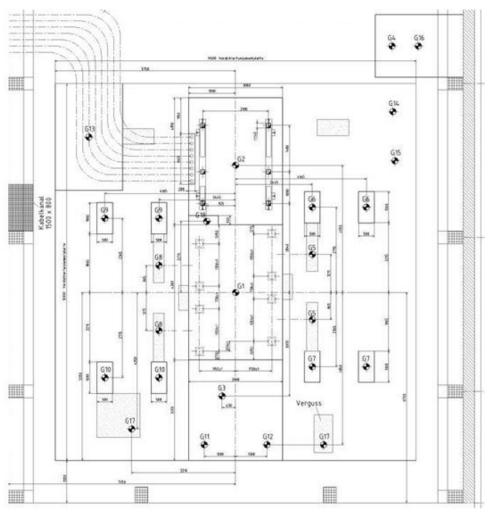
Typical foundation plan with an indication of dead weight loads (denoted as GXX)
